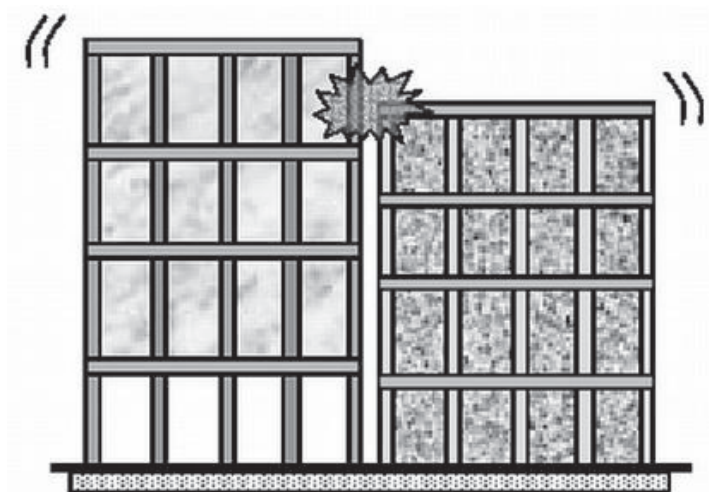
Pounding can occur between adjoining buildings due to horizontal vibrations of the two buildings
